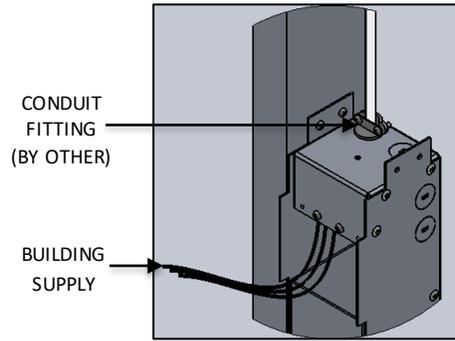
DETAIL SHOWING BUILDING SUPPLY AND CONDUIT FITTING
